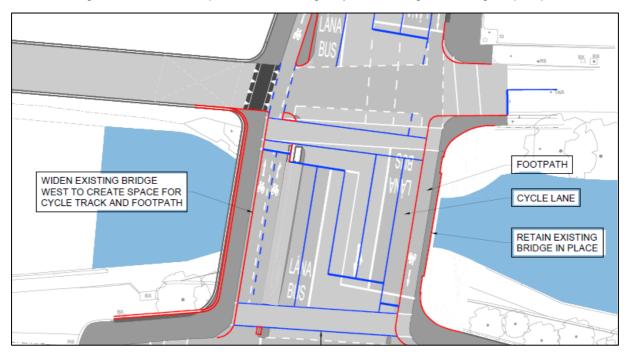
Widening of Robert Emmett Bridge Option B
